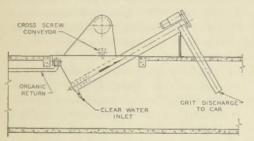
Grit washing arrangement, Racine, Wis.
